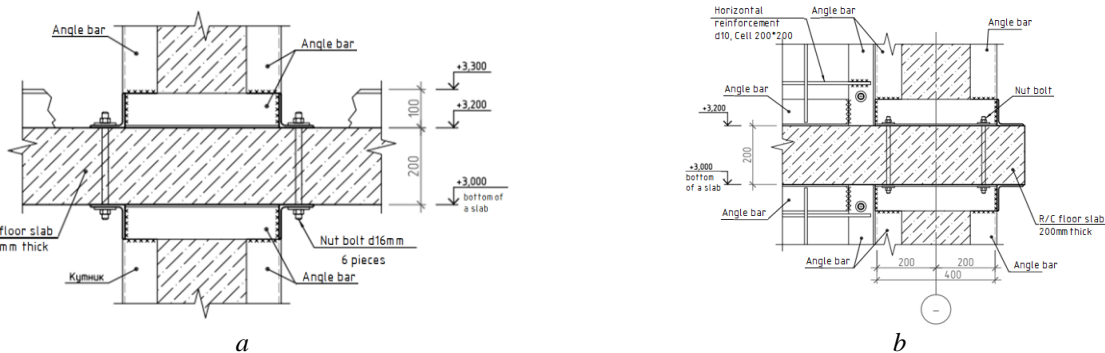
Recommended strengthening schemes of vertical structural elements: a – columns; b – shear walls
